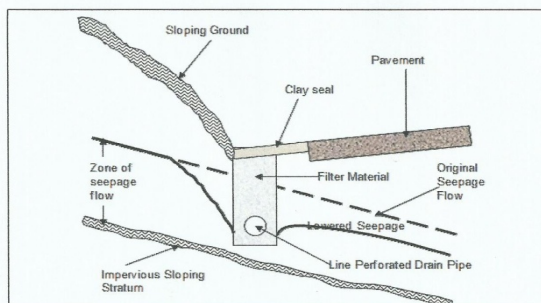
Highway underdrain slope drainage. (Wignall and Kendrick, 1982).
